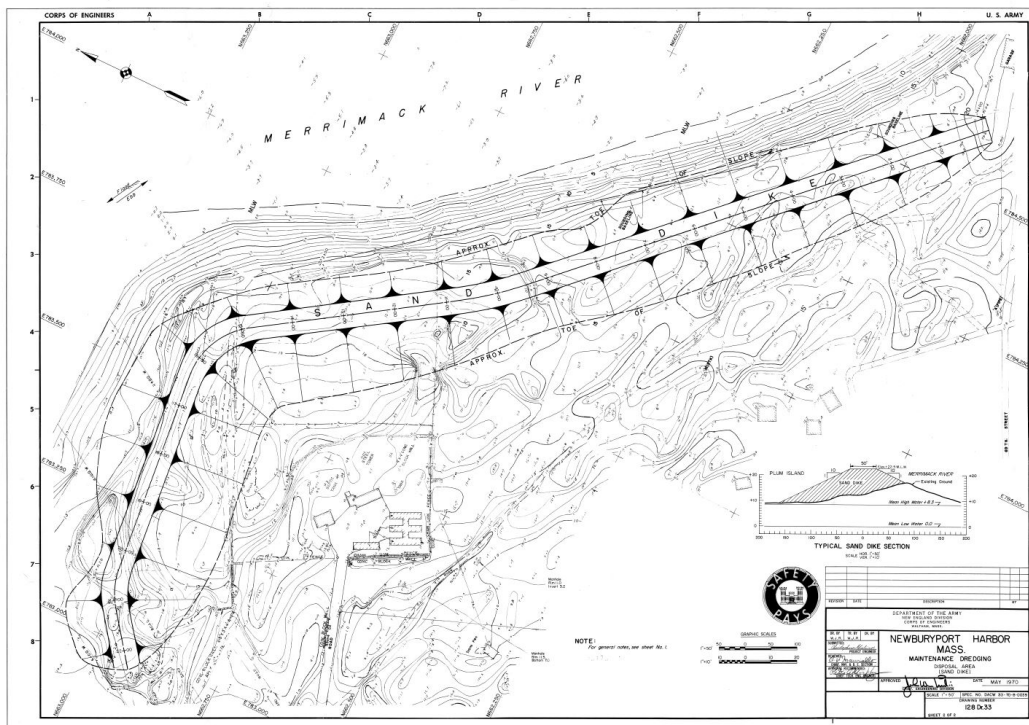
Final design plan for the 1970 Reservation Terrace sand dike. The berm elevation of the sand dike was 18.2 feet NAVD.
